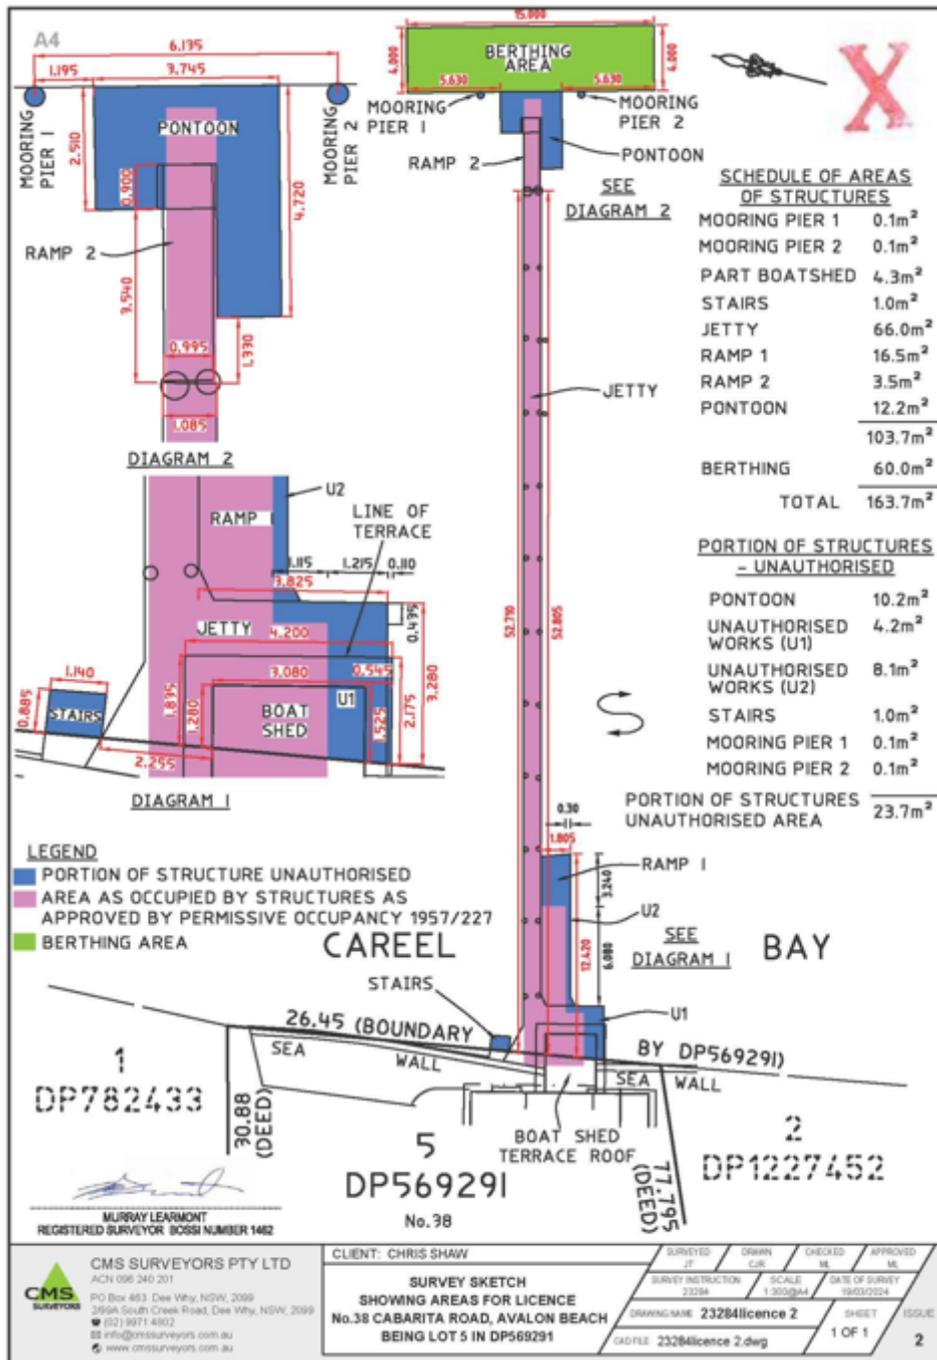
19 March 2024 Survey detailing approved and unapproved structures the pontoon facility and the proposed berthing pen
